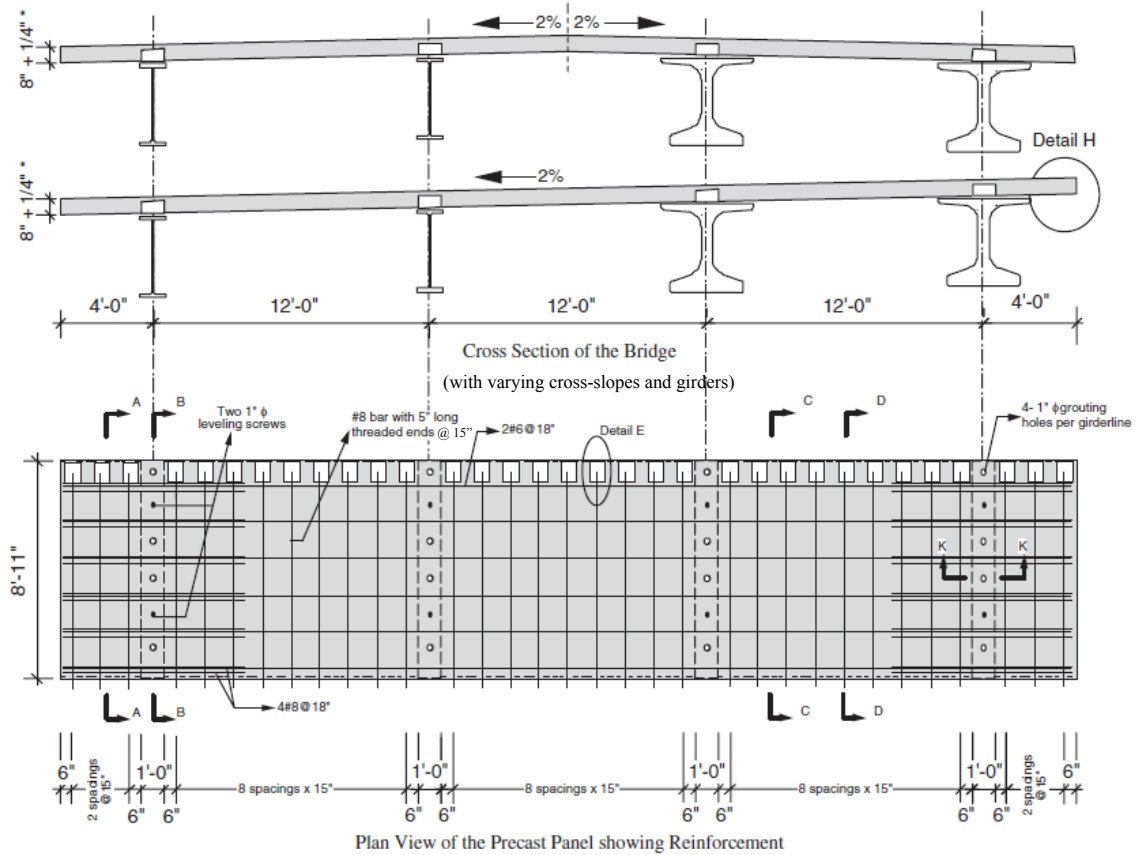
NCHRP System CD-2 Plan and Section (Badie and Tadros 2008)
